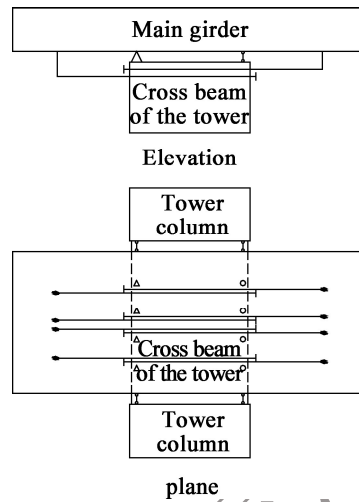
Temporary fix between girder and tower in sutong yangtze river highway bridge
